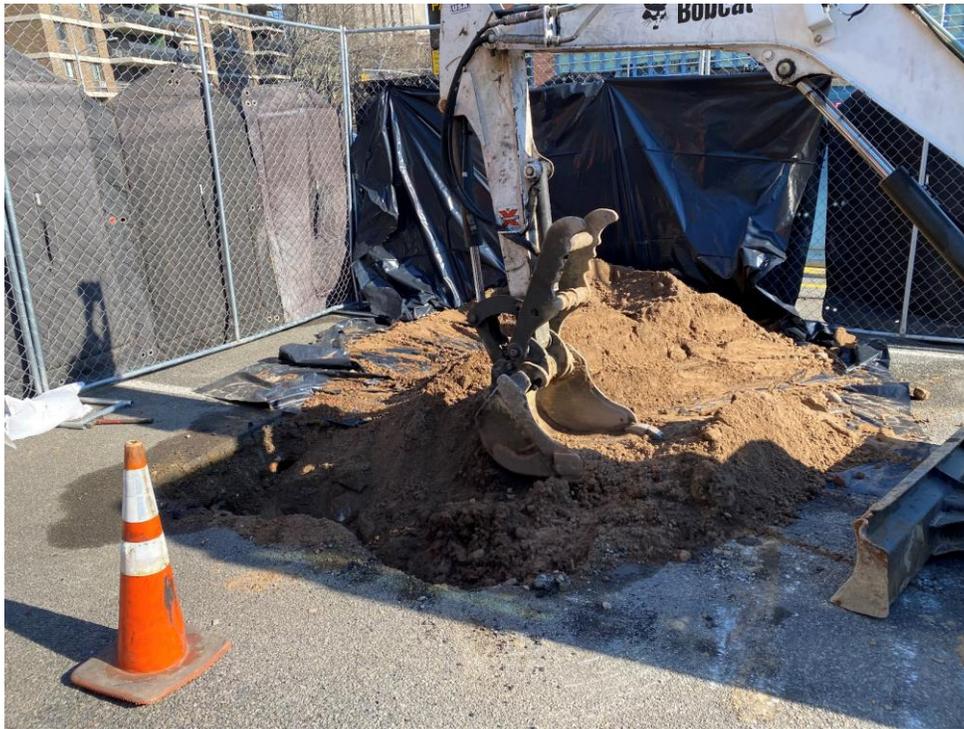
View of AARCO backfilling test pit TP01 (facing northeast) (02/12/2022)
